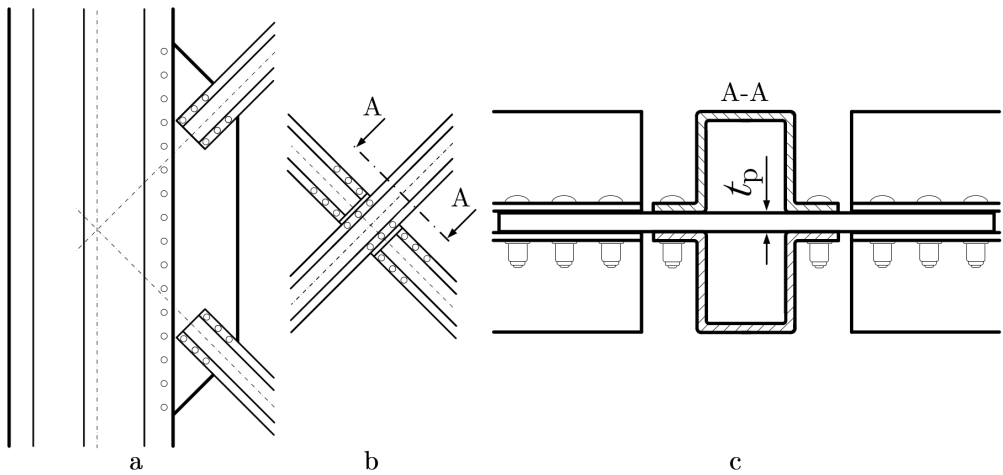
Joint details of the proposed lattice tower concept. View a shows the outer side of a leg profile with a gusset plate to attach the double bracing hat sections. View b shows the bracing members intersection joint and c a corresponding sectional view of it.
